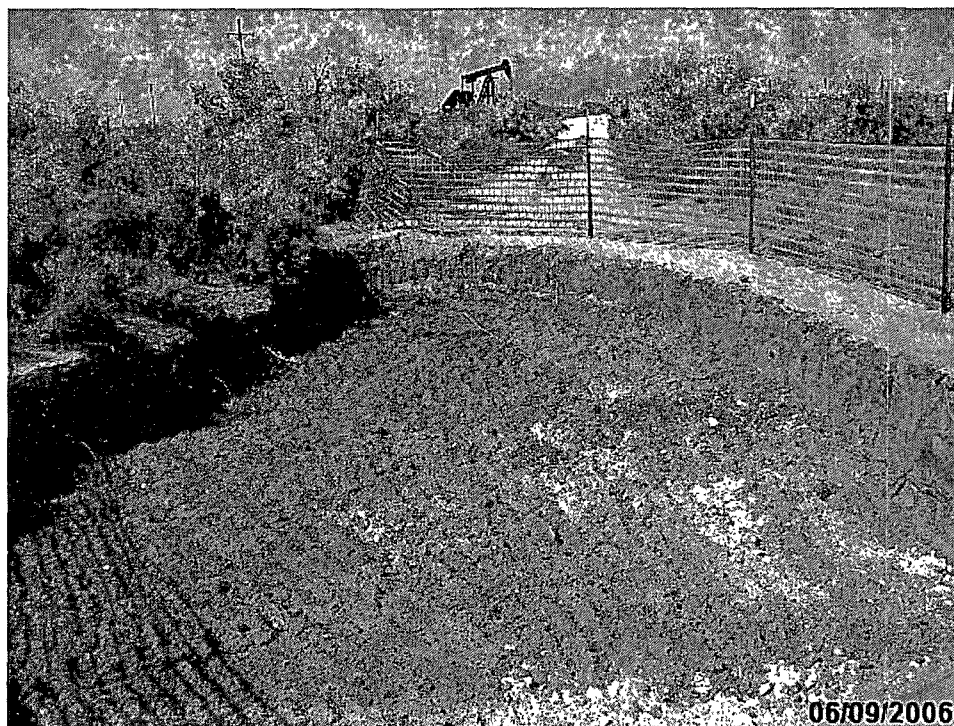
Looking southerly at excavation of Pooling Area 1 (Note-meter loop, heater treater/separator adjacent to excavation)
